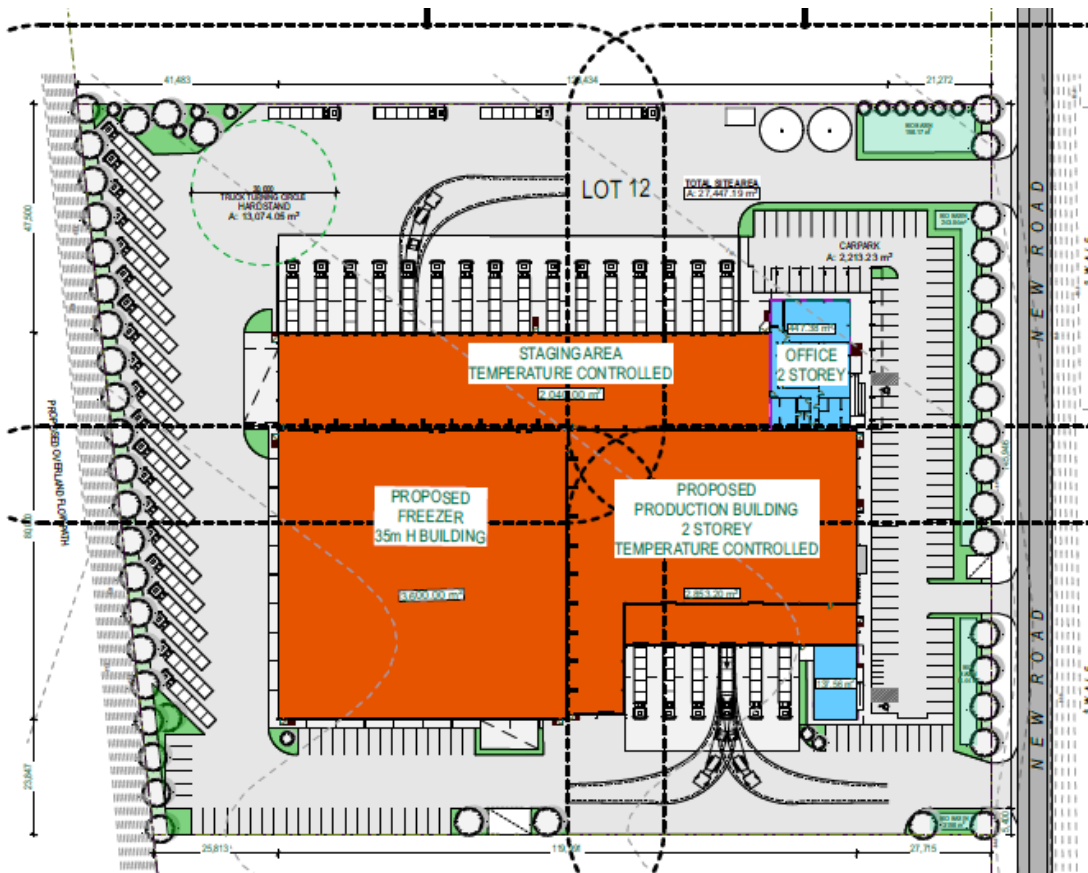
Site plan of proposed high impact industry and warehouse on Lot 12
